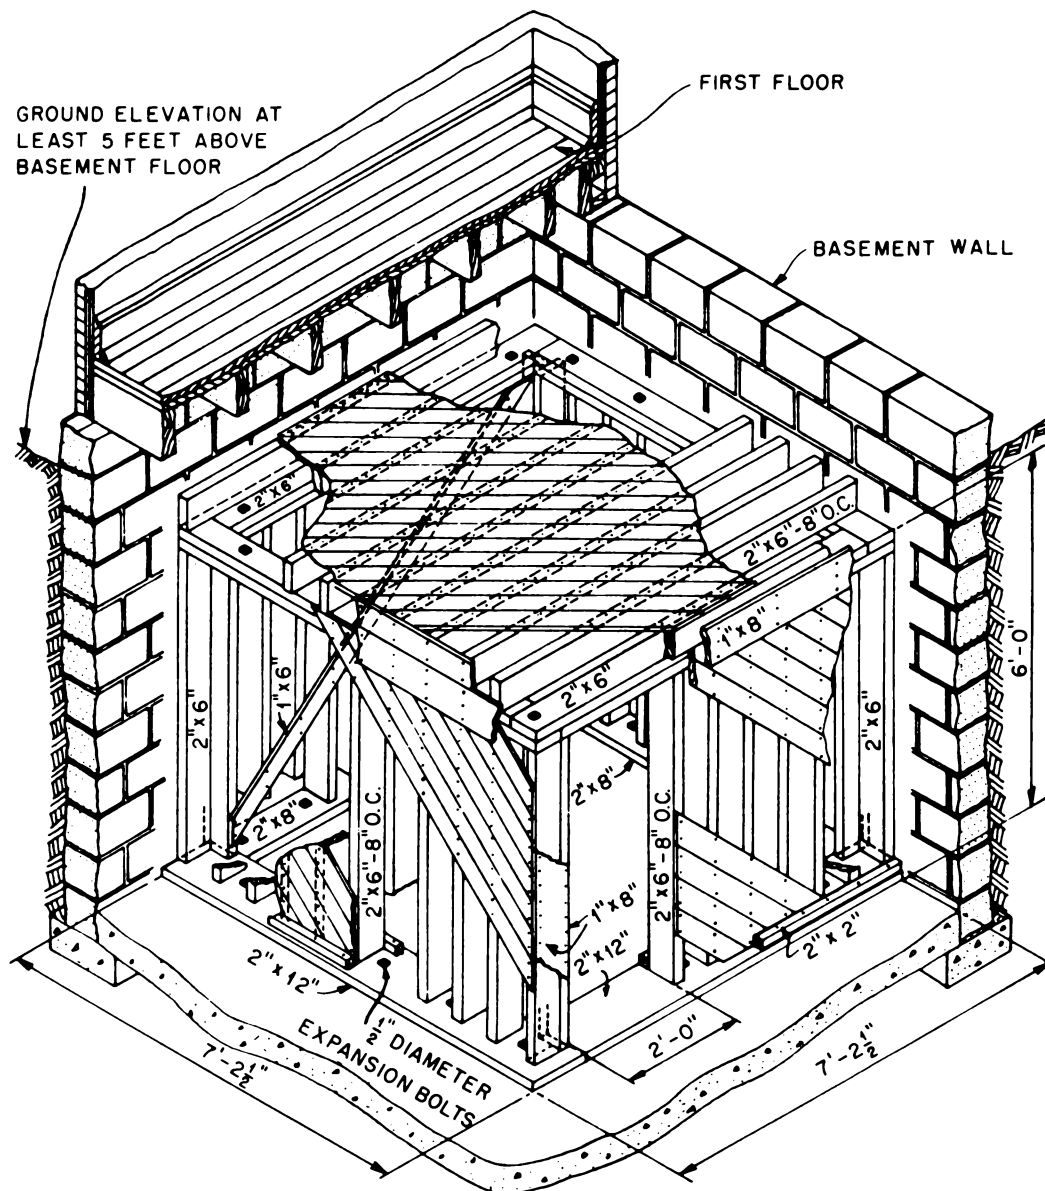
Basement corner room tested at 3500 and 7500 ft. All wood to be not less than No. 2 common. Roof to be prefabricated and erected as a unit.
